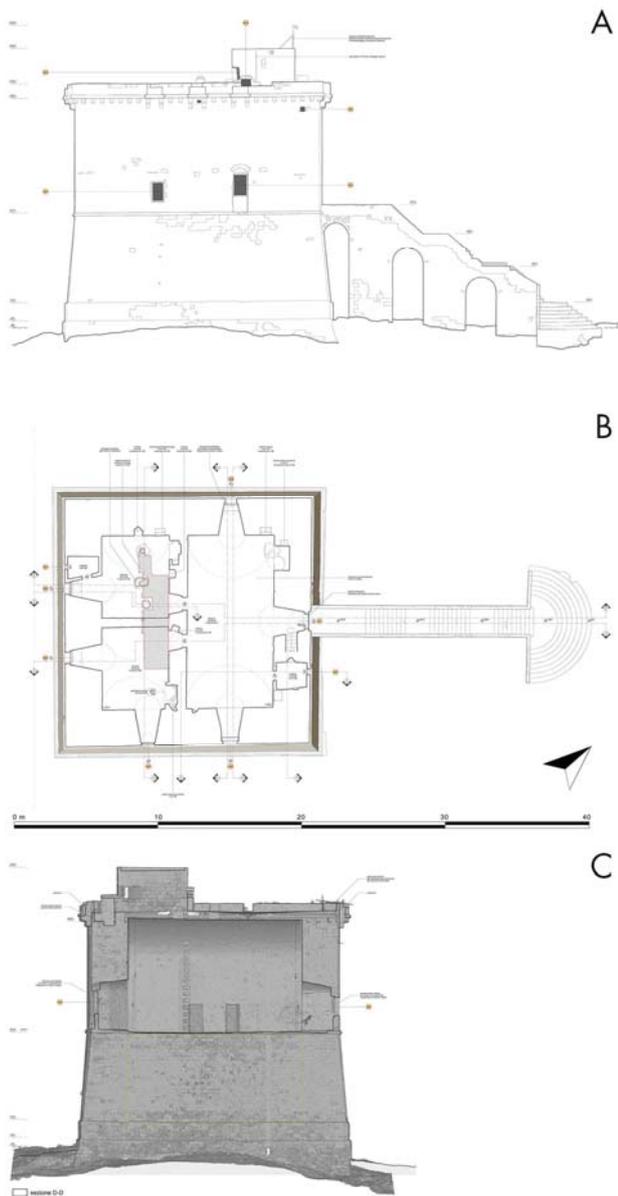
The coastal tower of Santa Maria dell'Alto: a) south elevation; b) planimetry; c) longitudinal section.
